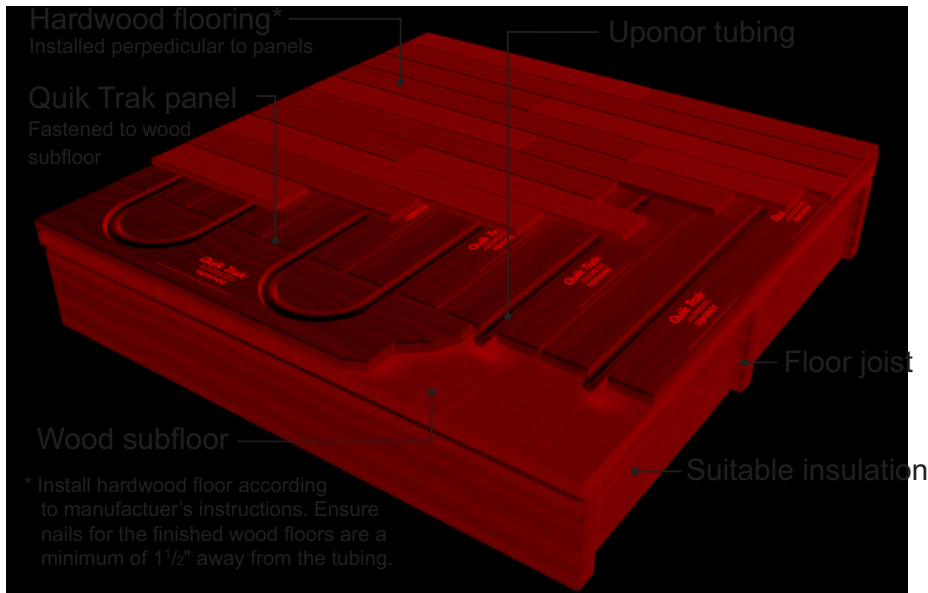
Quik Trak over a wood subfloor with hardwood floor covering
